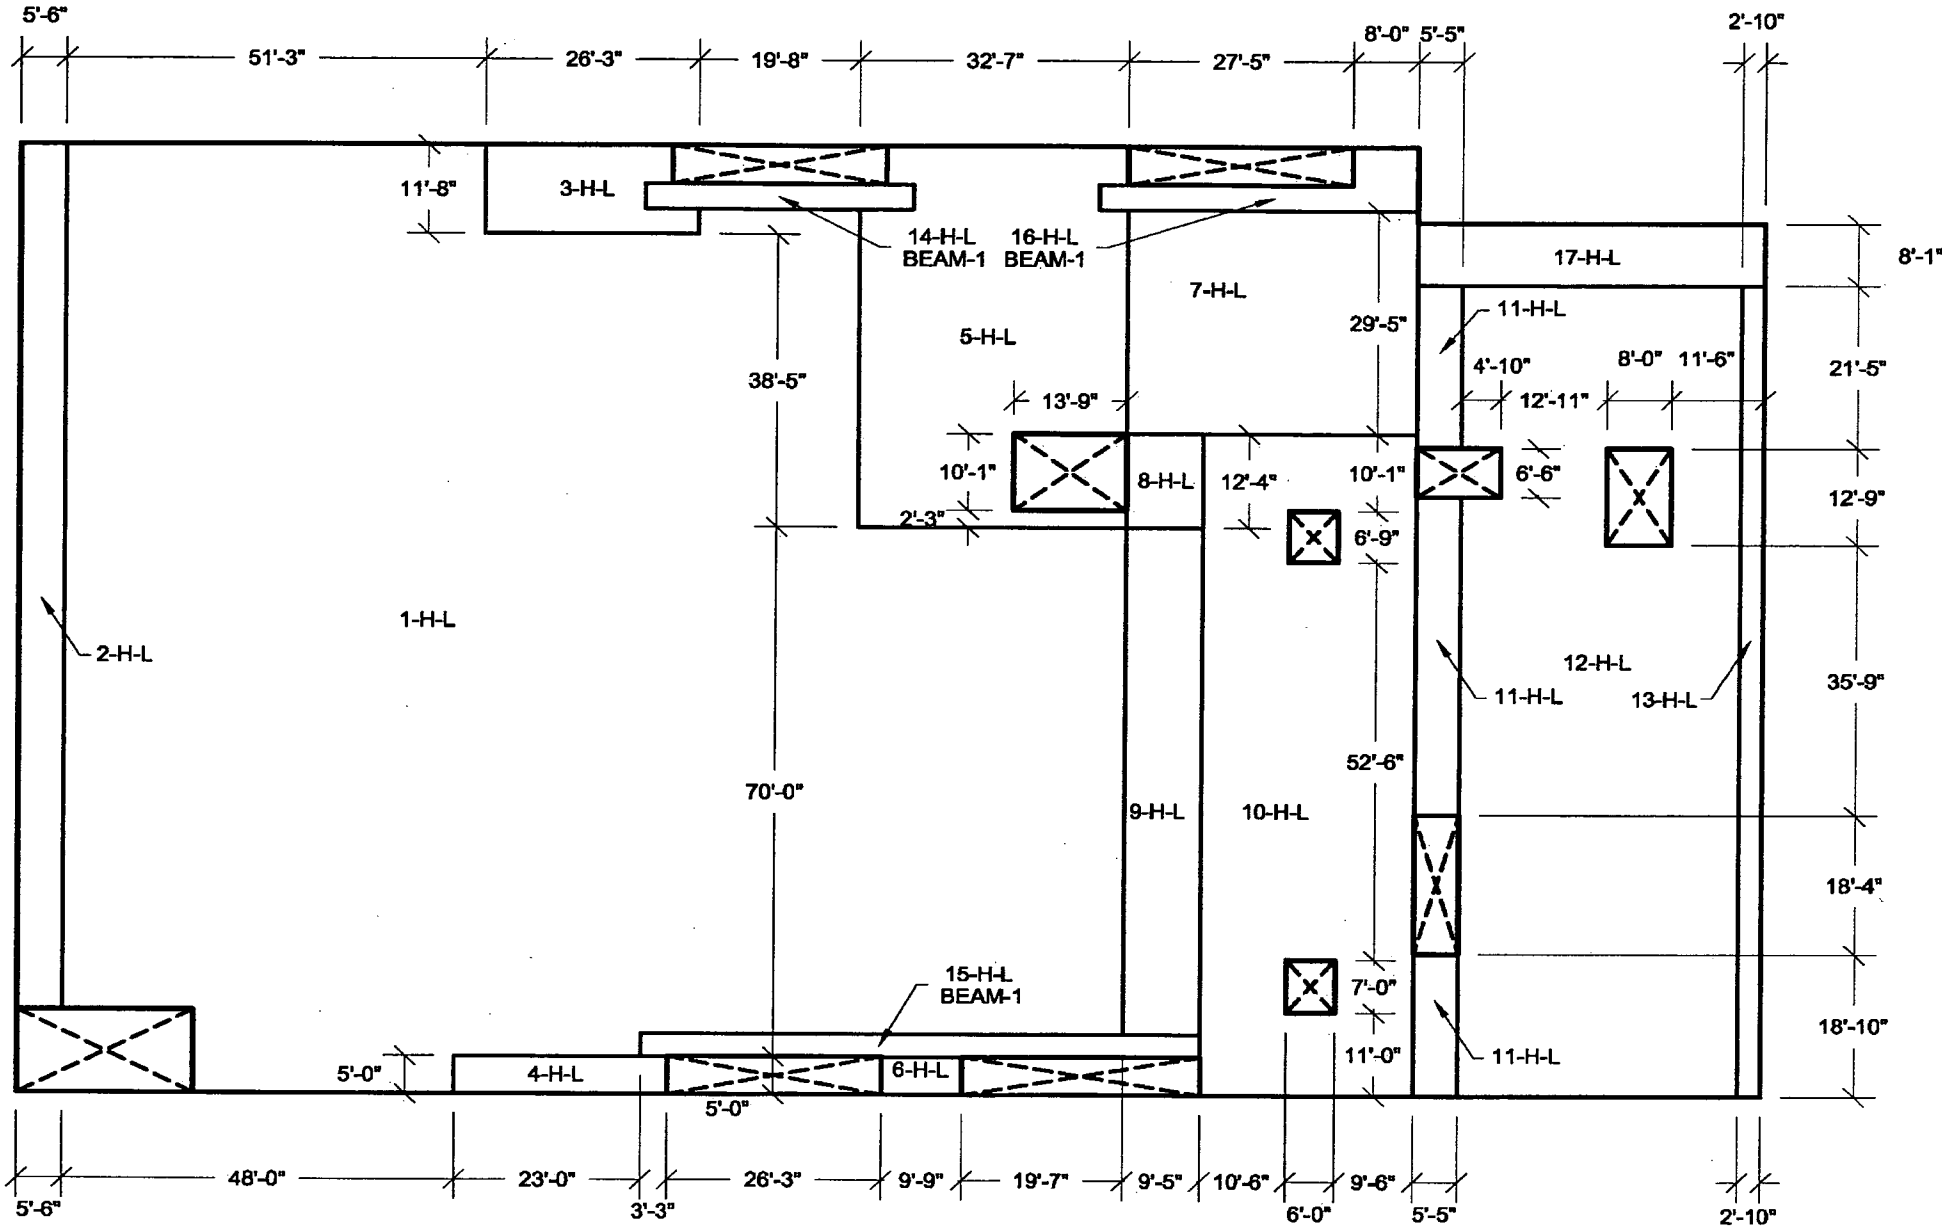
H.3-33: ELEVATION 35 LOOKING DOWN
